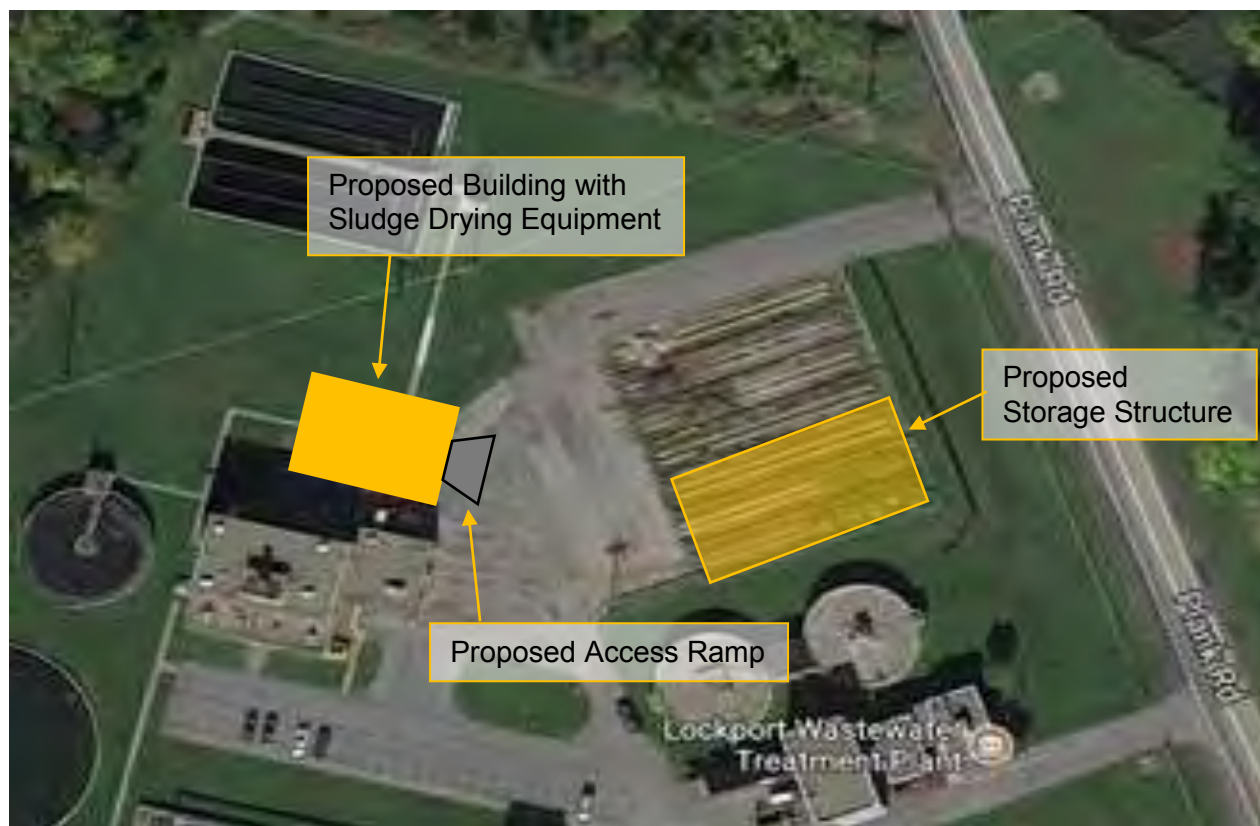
Proposed Building to House Sludge Dryer Equipment
